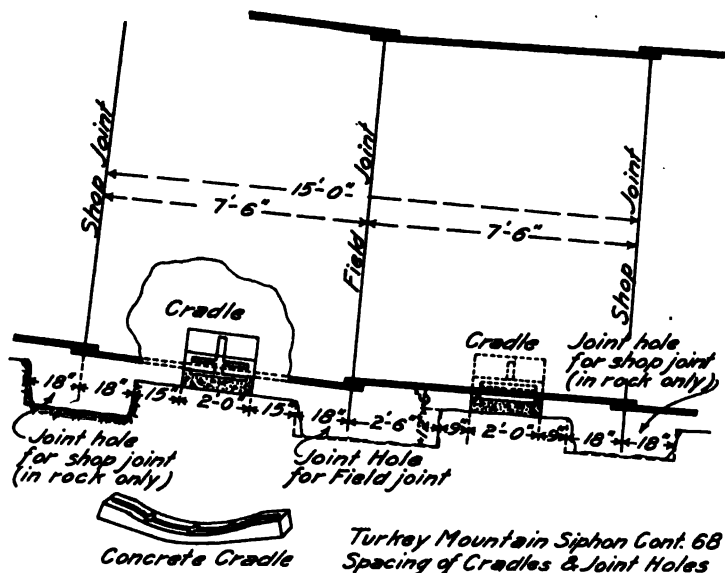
TYPICAL ARRANGEMENT OF CONCRETE CRADLES AND JOINT HOLES FOR FIELD RIVETING.
